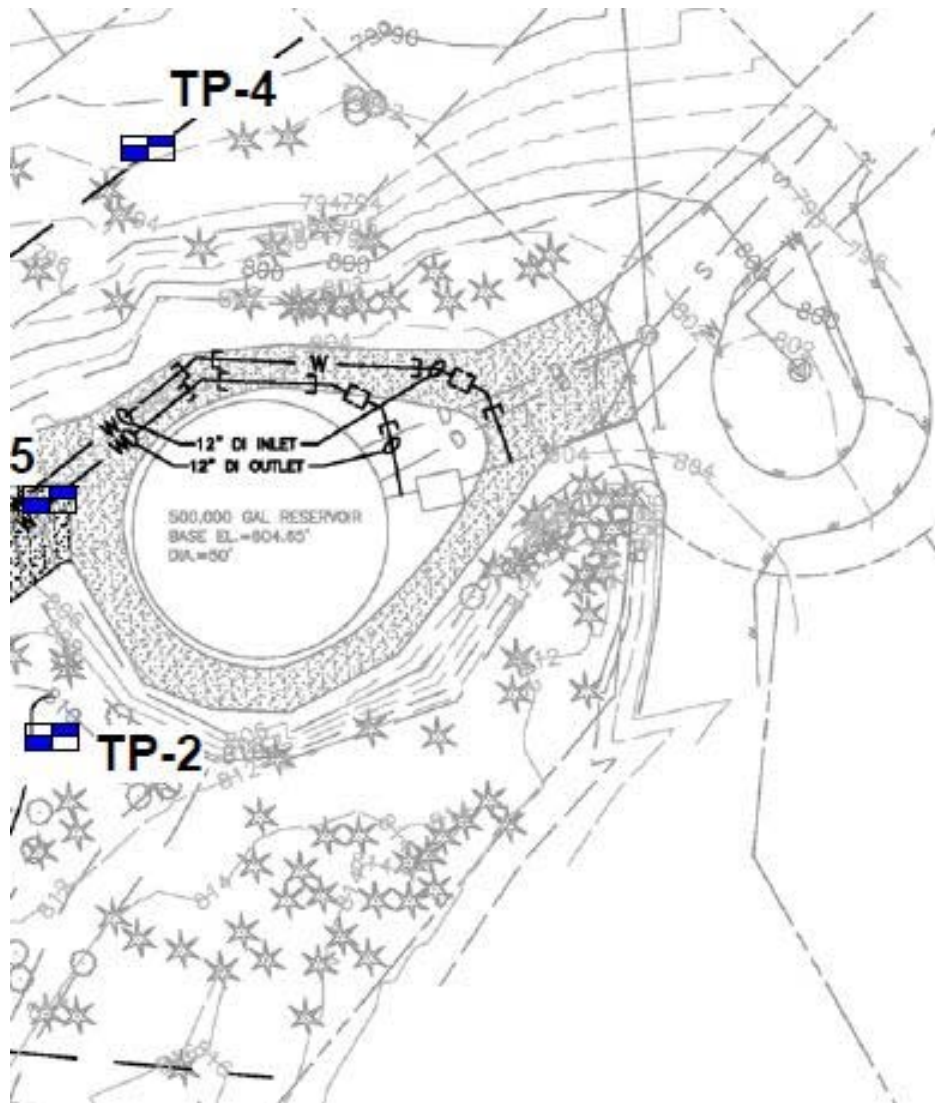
Division 22 Reservoir Site Plan from PanGeo Report
